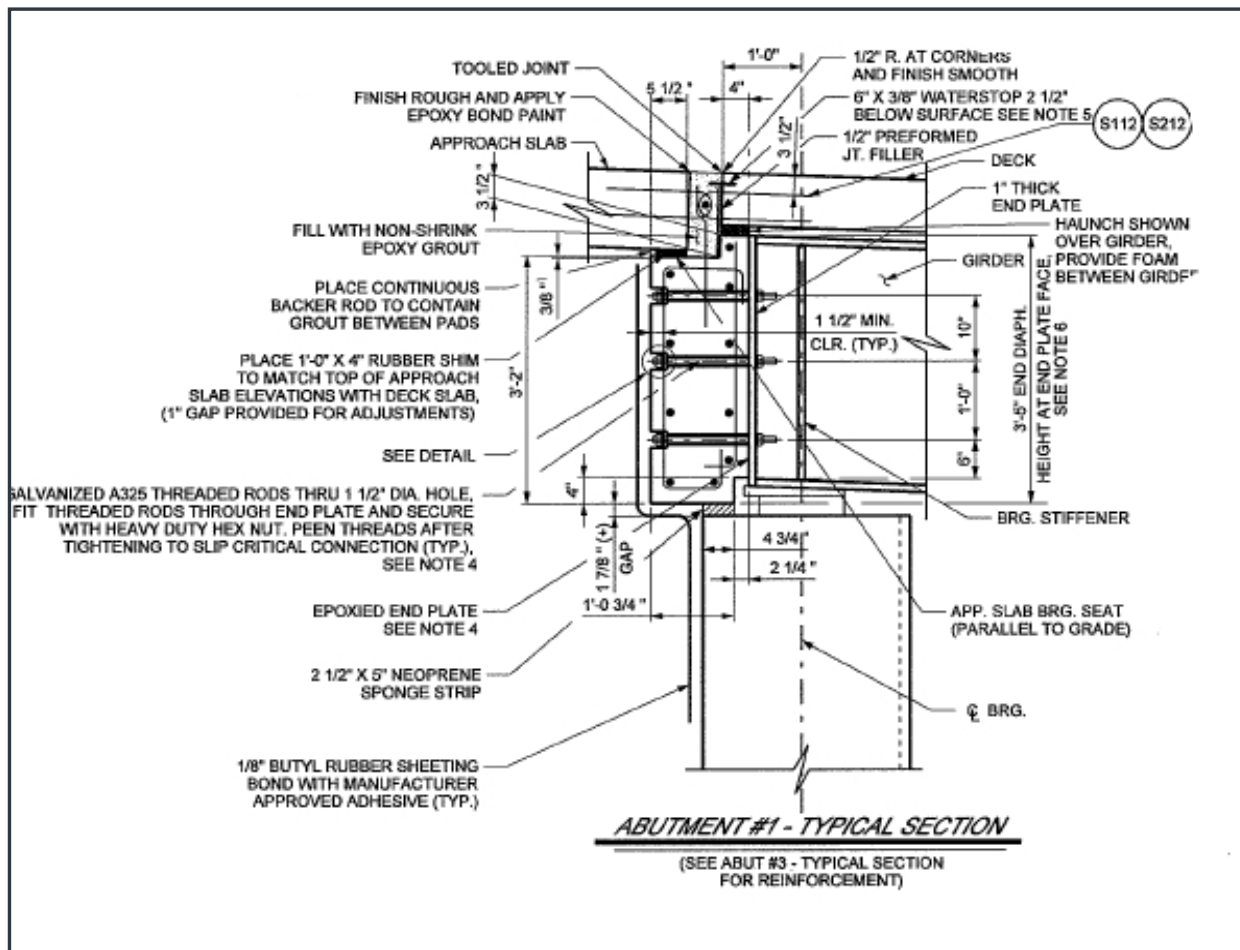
Precast abutment end diaphragm bolted connection in Utah
